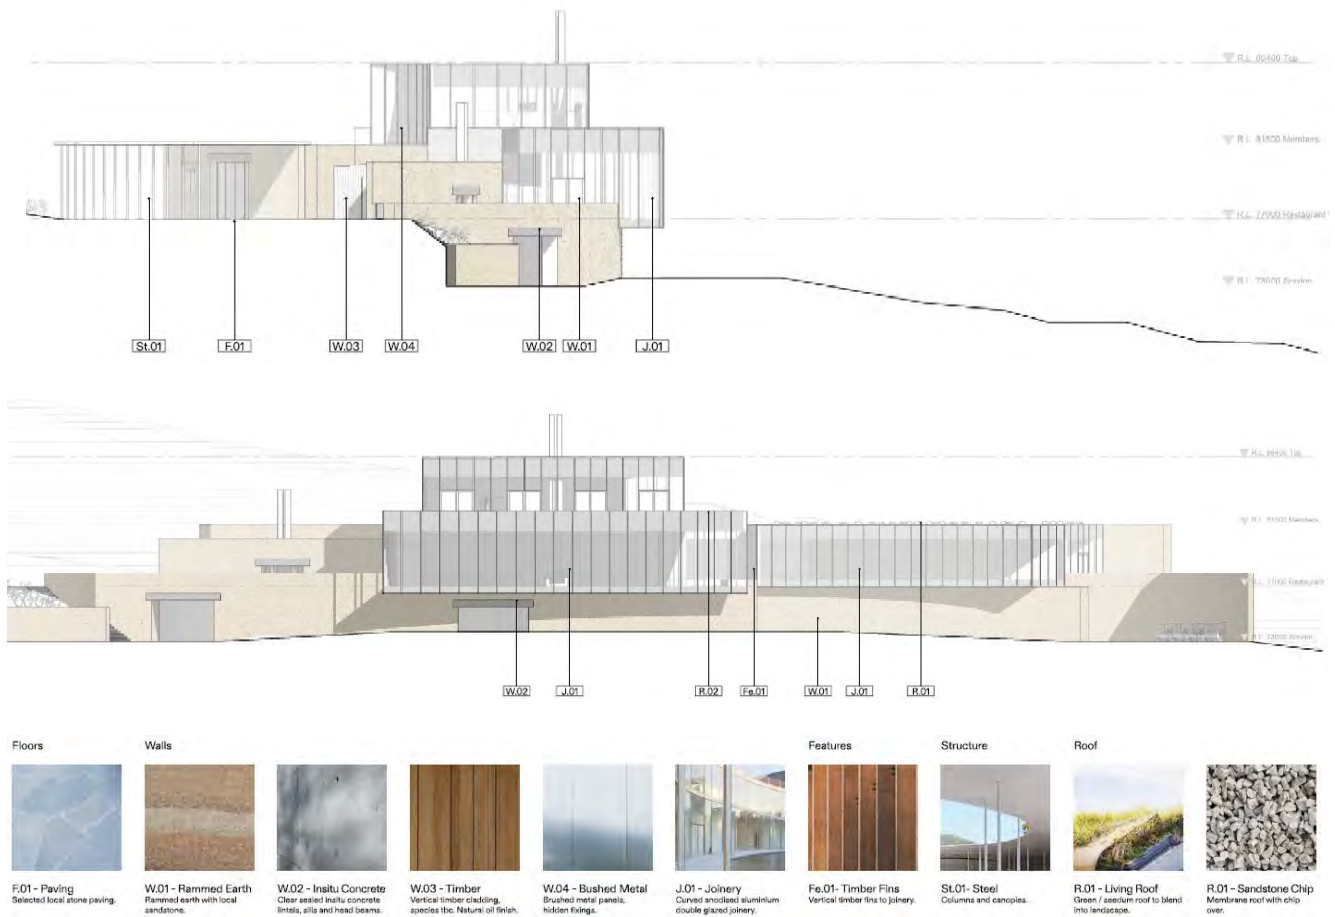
Proposed Clubhouse Elevation Drawings and Materiality
